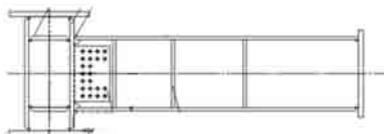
Configuration of Test Specimen for Beam-to-Column Joint
